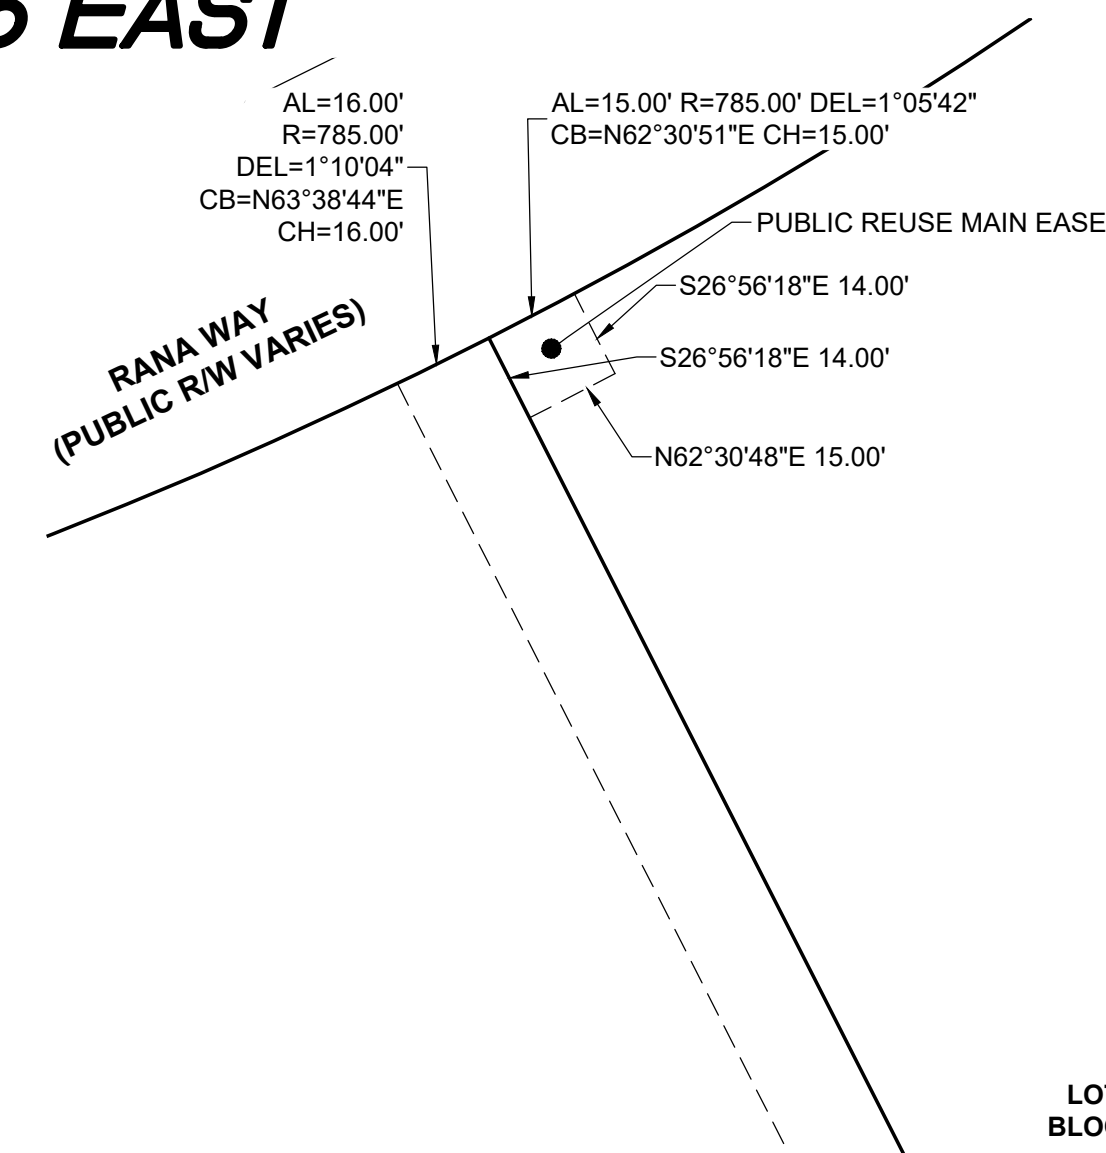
DETAIL A, PUBLIC REUSE MAIN AND PUBLIC SANITARY SEWER EASEMENTS (SEE SHEET 6)
